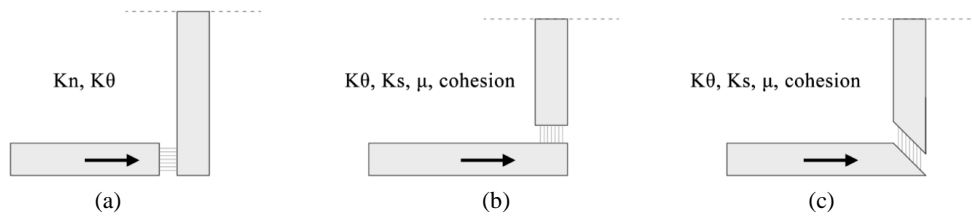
AEM: different types of wall-to-wall connections that may be adopted
